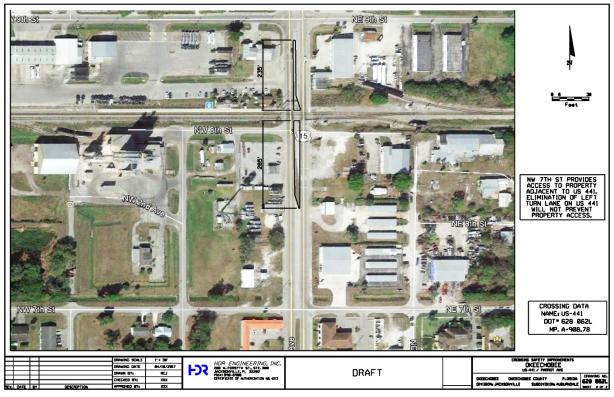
US 441/Parrott Ave (628062L) - Preliminary Grade Separated Concept Plan
